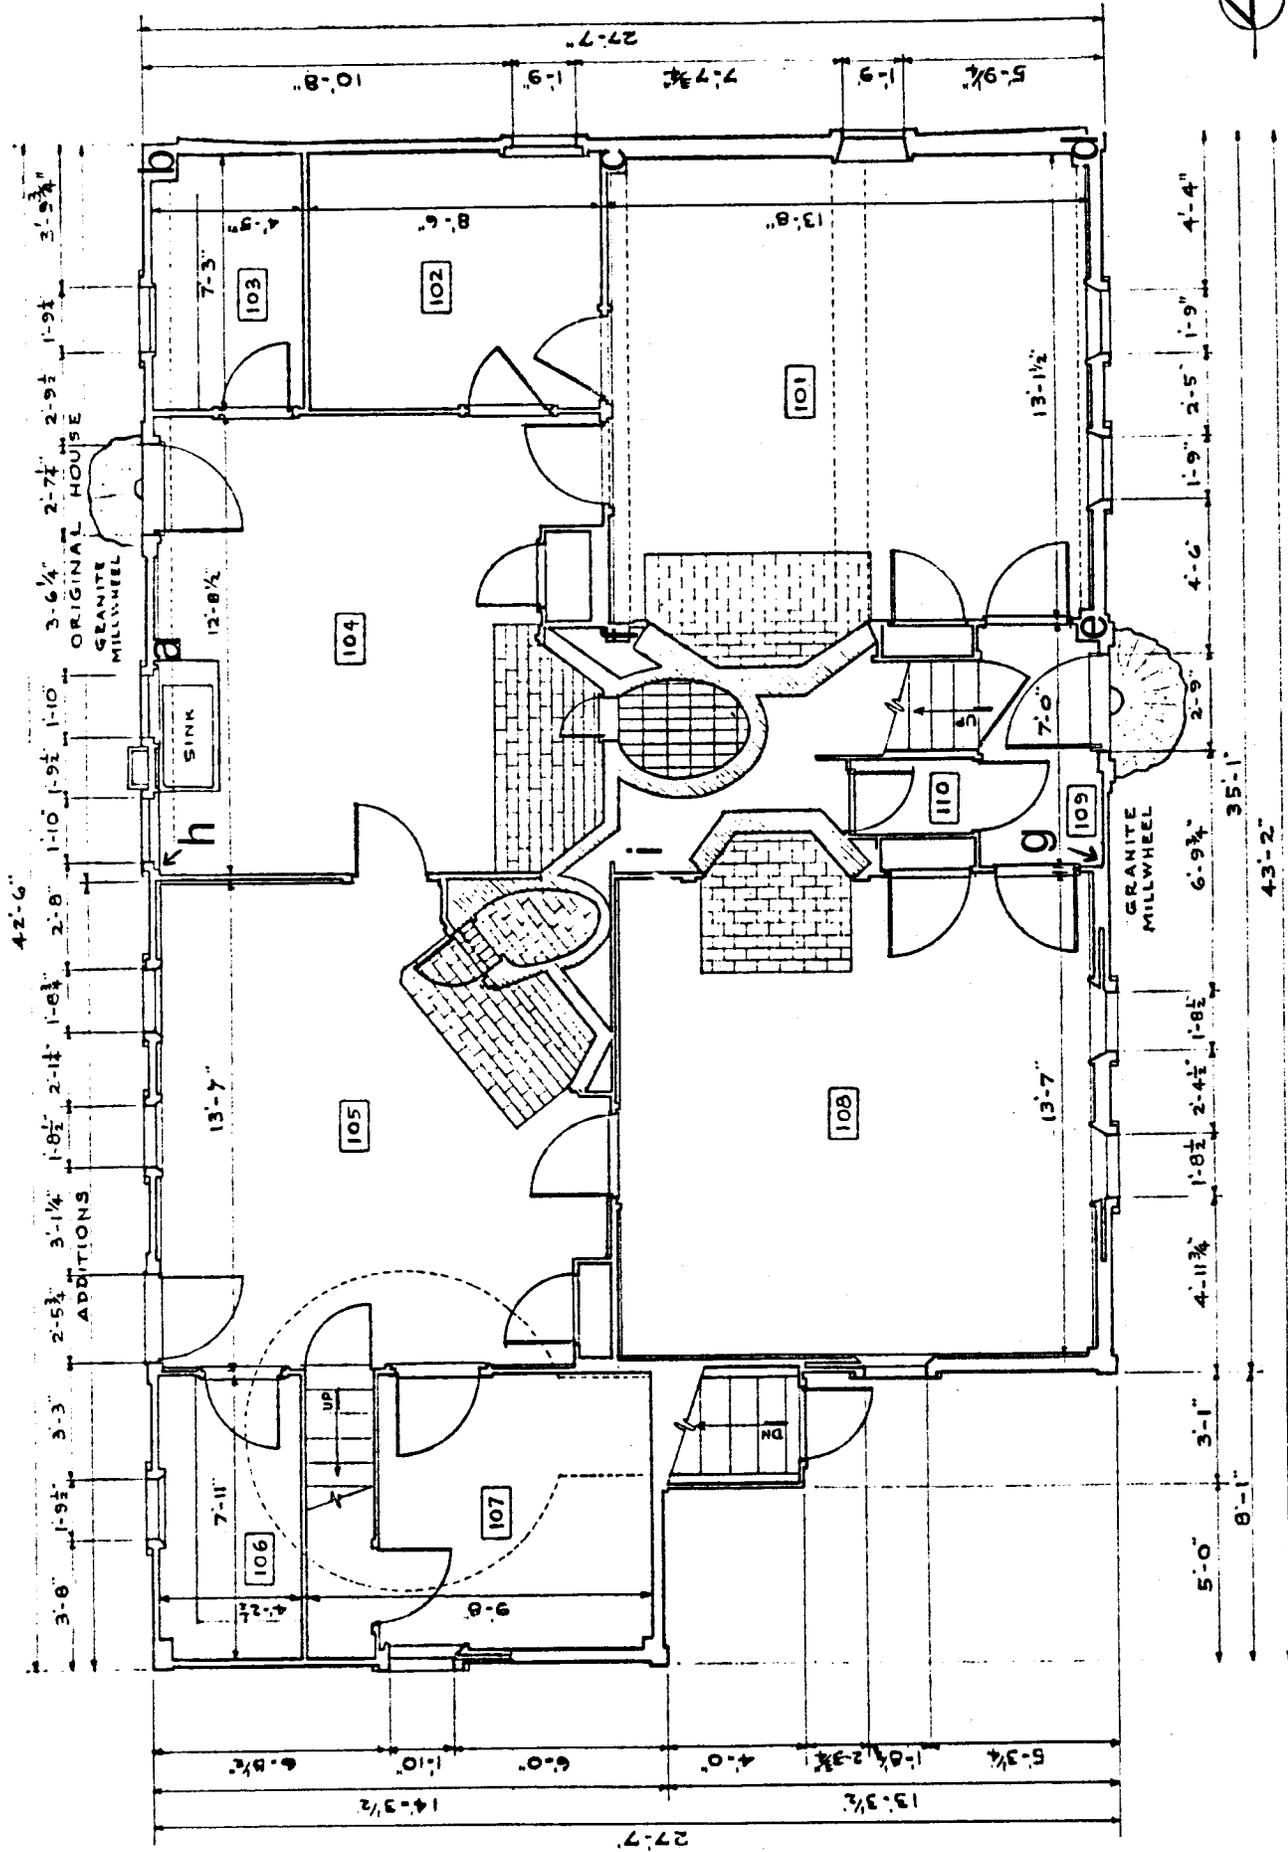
Atwood-Higgins House: Plan of First Floor.
